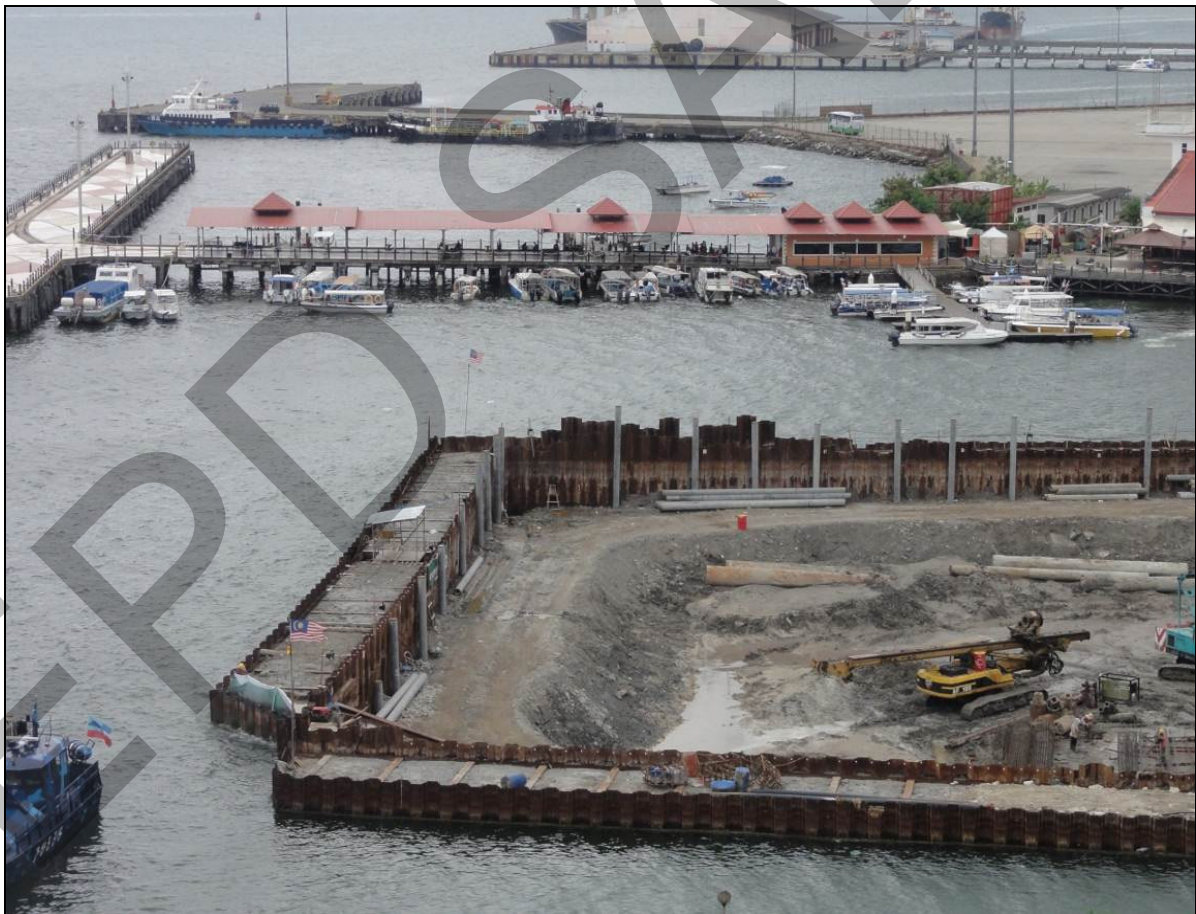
Example of reclamation carried out through initial construction of a cofferdam with subsequent construction/filling inside the drained area
